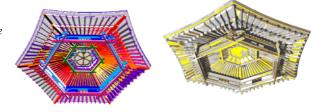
Roof - engineering Figure 9b: Roof - wire frame 3D CAD model drawing
